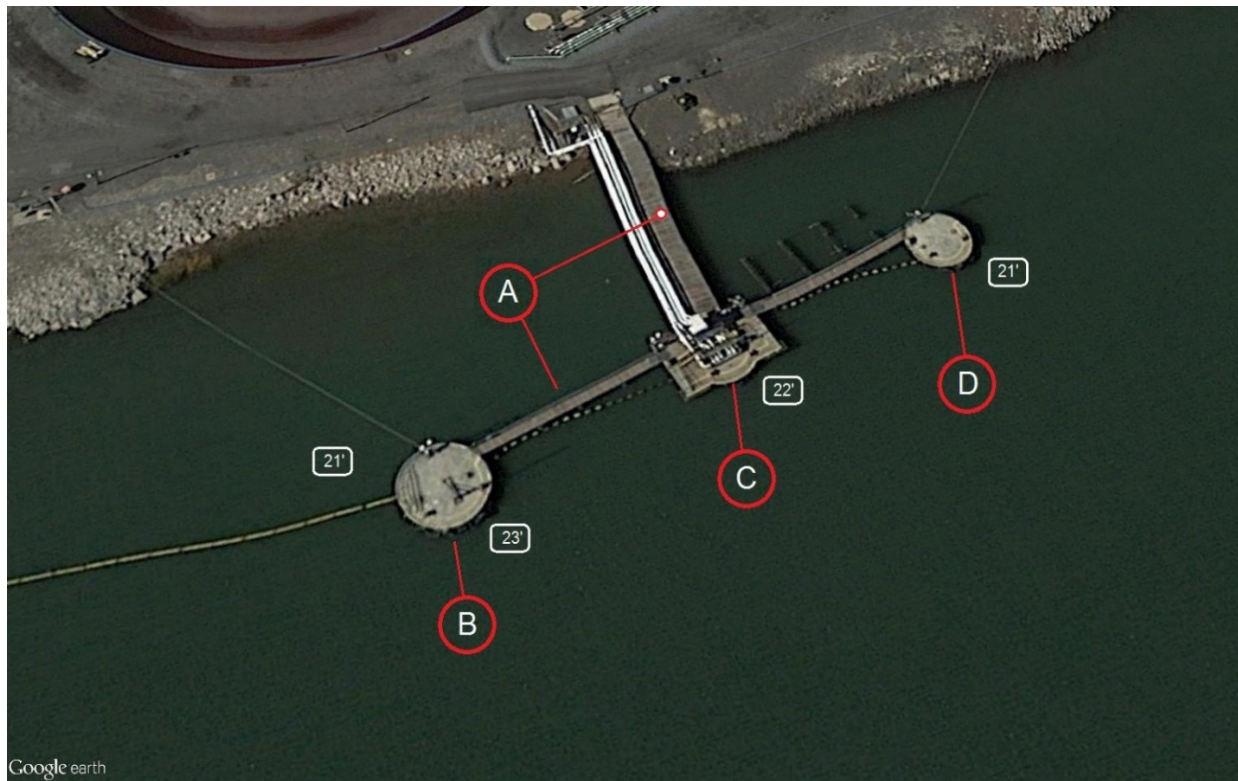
Three steel sheet pile cell berth. Center cell is the loading platform.
